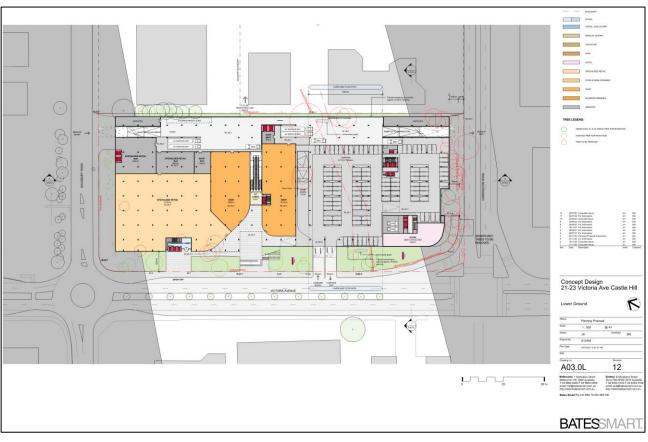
Proposed Architectural Plan (Lower Ground Level)
